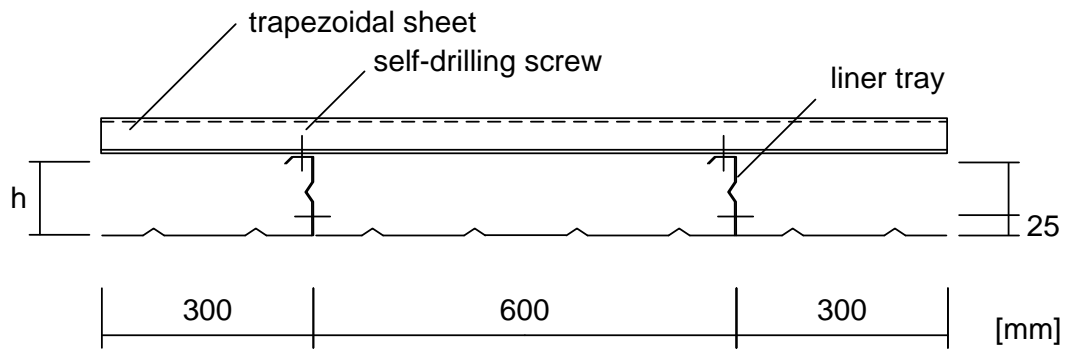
Cross section of the test specimens for single span positive bending tests (SSP) and internal support tests for uplift loading (IS-W)
